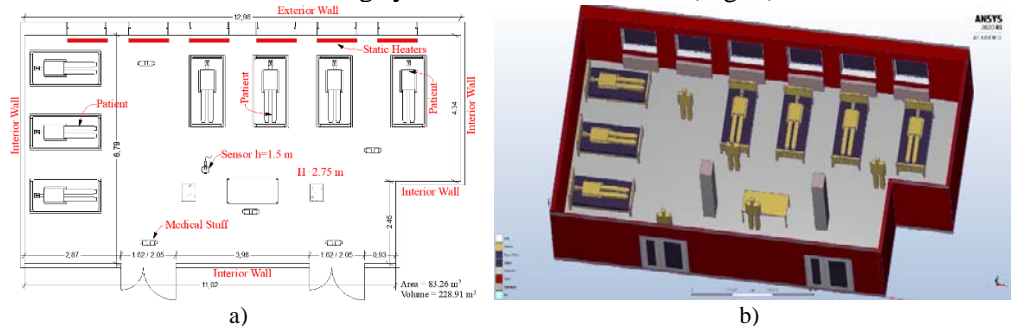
a) The floor plan of the studied model b) 3d zone model
